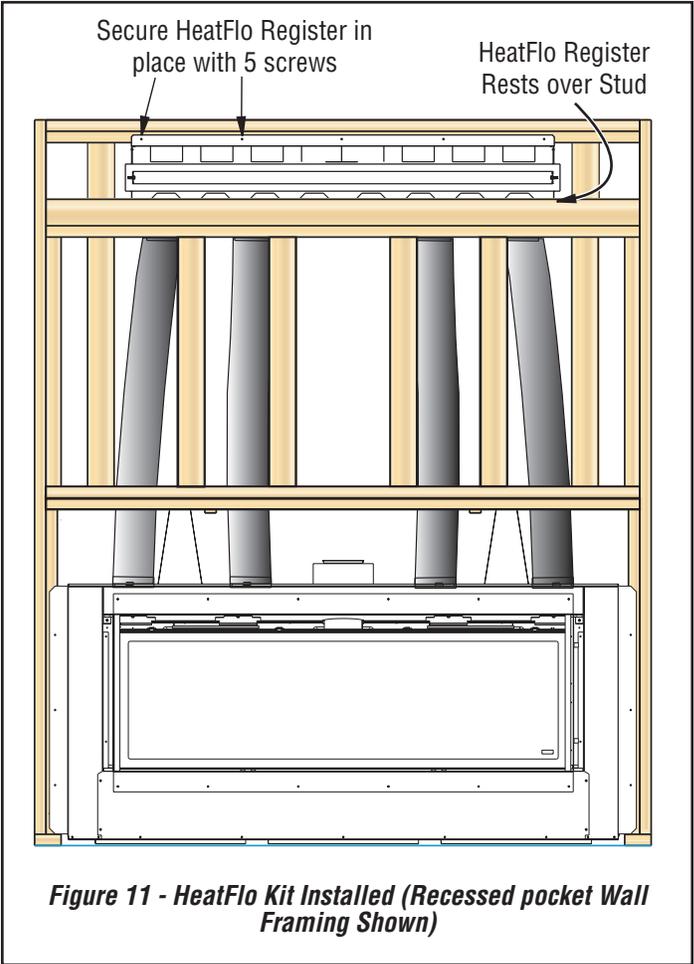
HeatFlo Kit Installed (Recessed pocket Wall Framing Shown)
